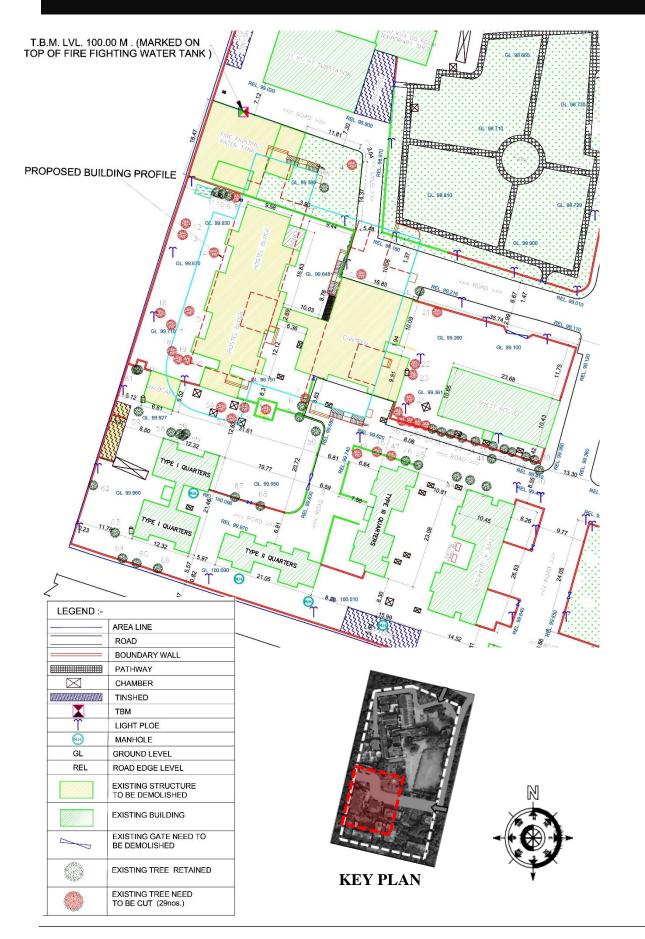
DETAIL OF TREES IN PROPOSED NEW HOSTEL BUILDING AT LBS NATIONAL SANSKRIT UNIVERSITY, NEW DELHI
